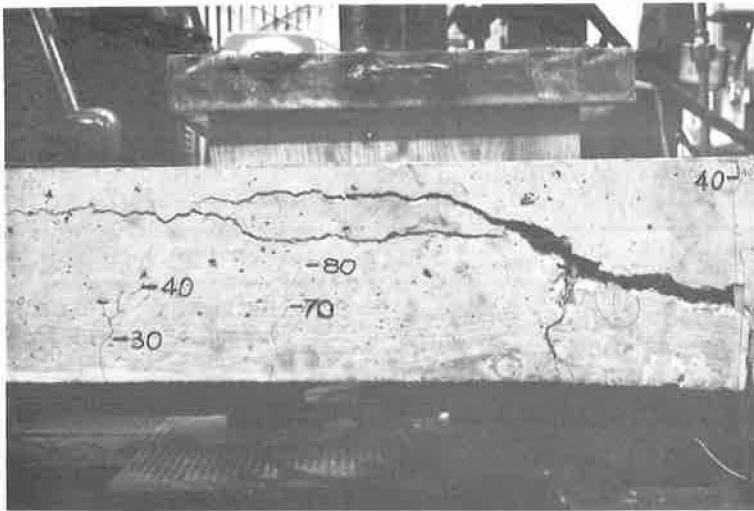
View of transverse face of failed test unit with 10-in. stud spacing; large failure cracks developed suddenly at main load of 105,000 lb.
